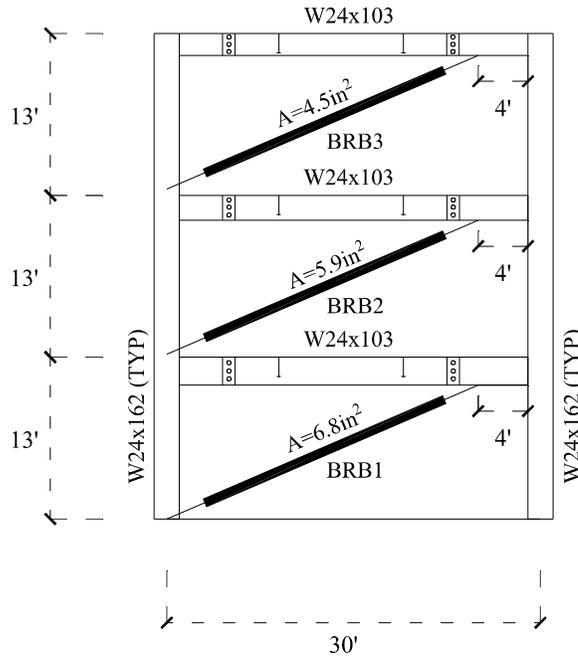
Elevation view of BRBFs of interest for Model 2
